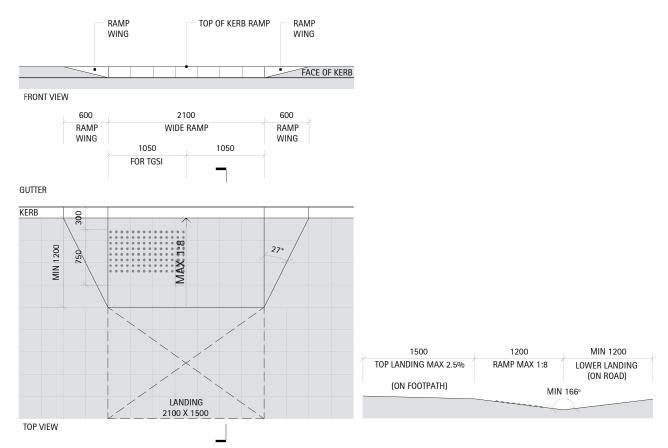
Kerb Ramp Layout: 2100 Wide
